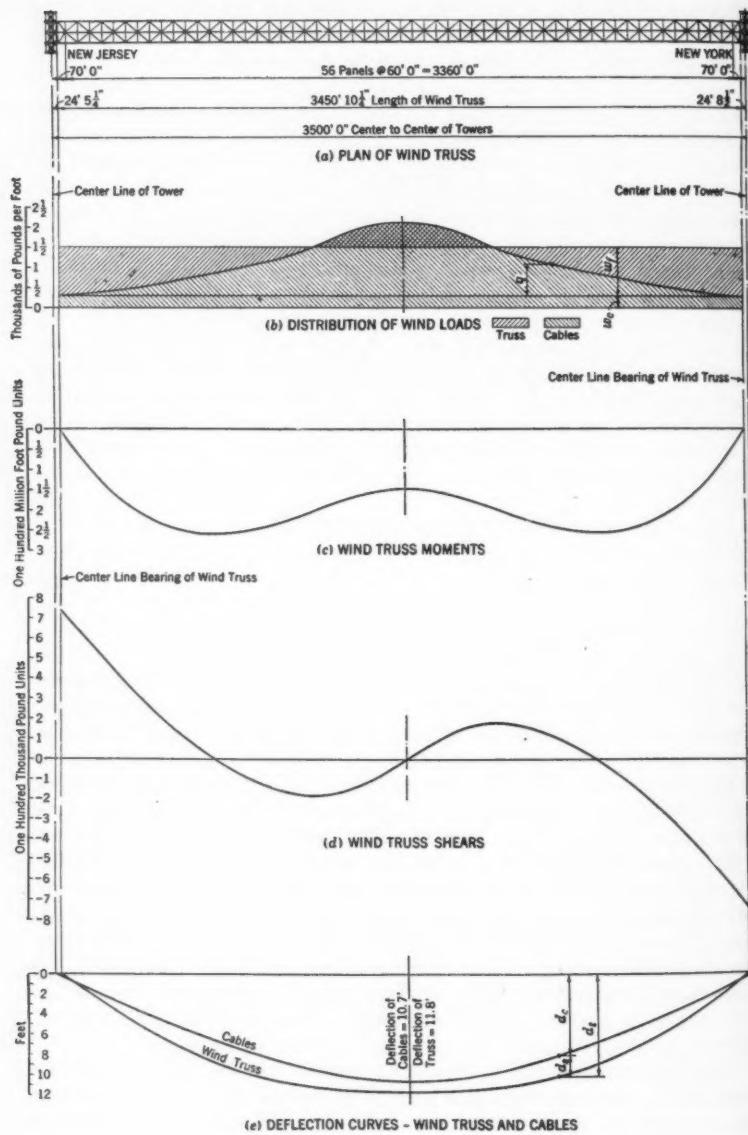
WIND SYSTEM, CENTER SPAN.
